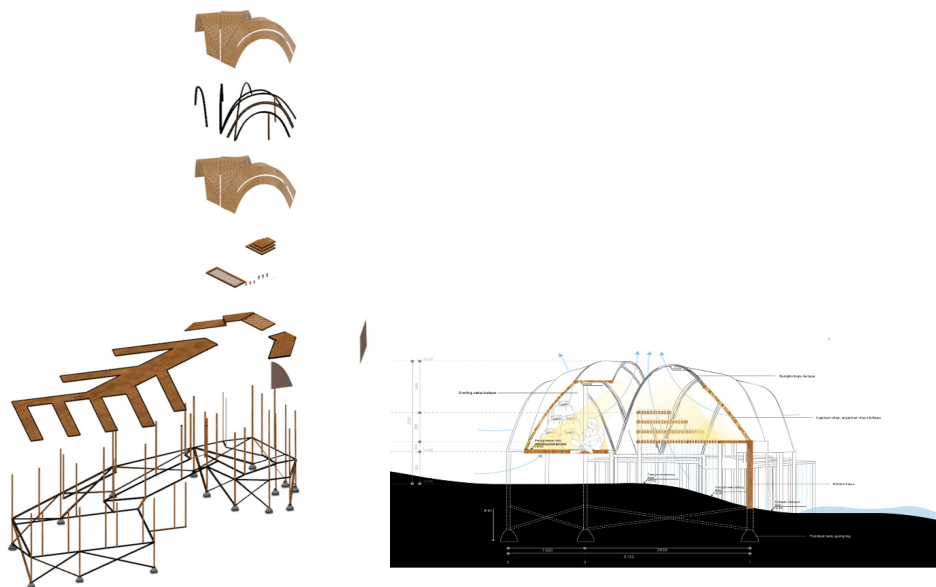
Example of low-tech design work with elevated and lowered floor composition
